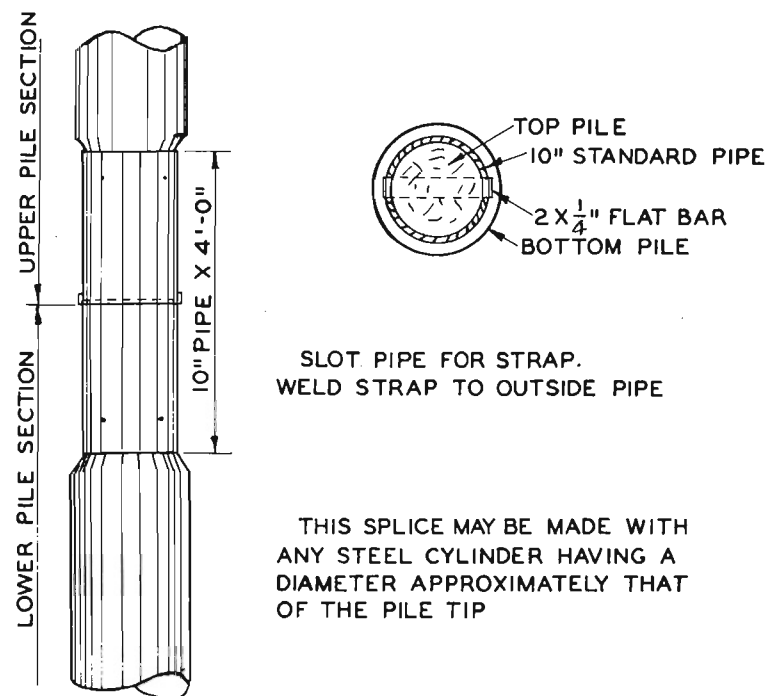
Timber-pile splice using steel line-pipe for a sleeve joint.
